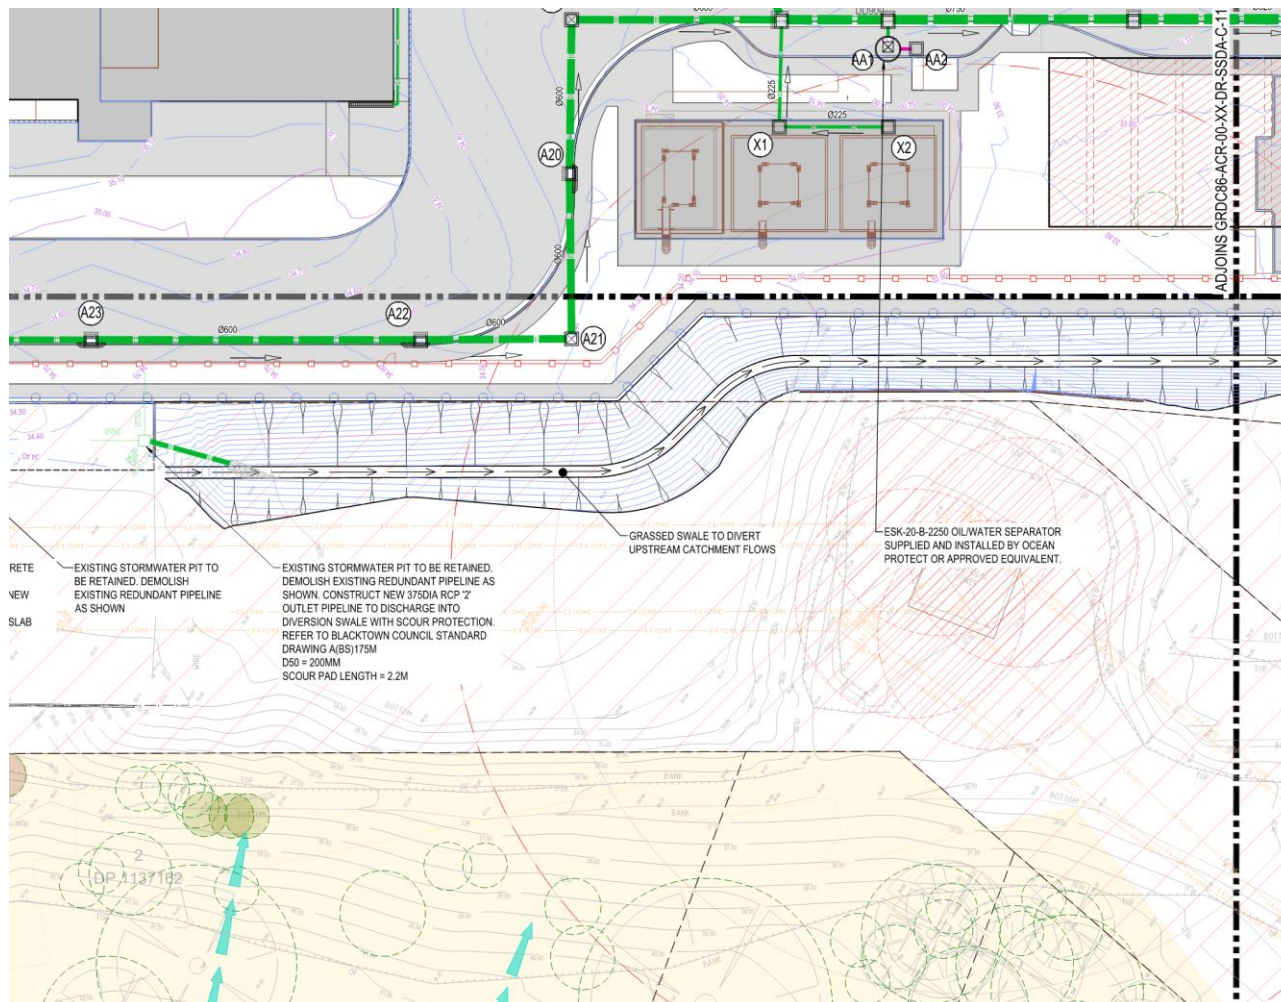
Post-Development Scenario – Swale Drain and Site Stormwater System
